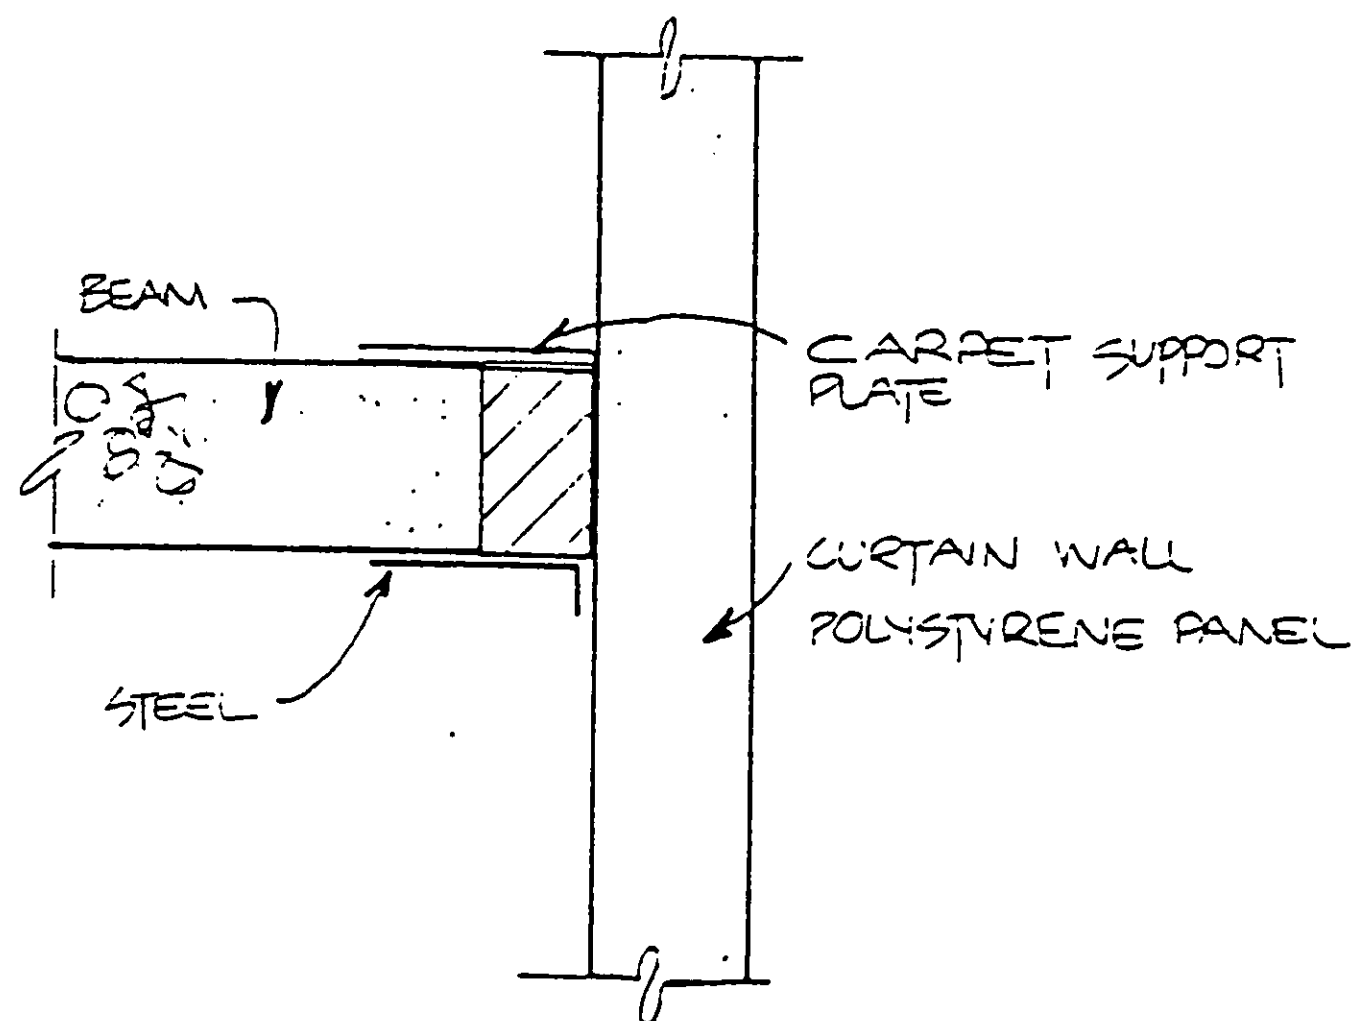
SECTION THROUGH CONCRETE FRAMED BUILDING WITH POLYSTYRENE / GLASS CURTAIN WALLING
